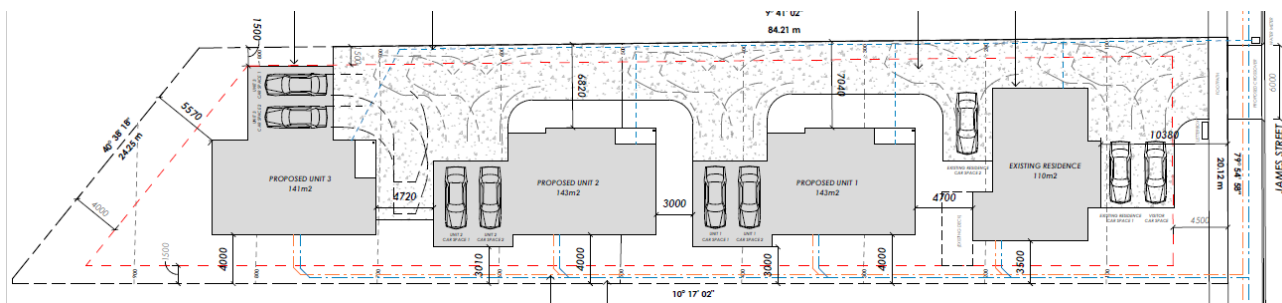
Proposed Site Plan, N + B, Project P18055, dated 29/06/18
